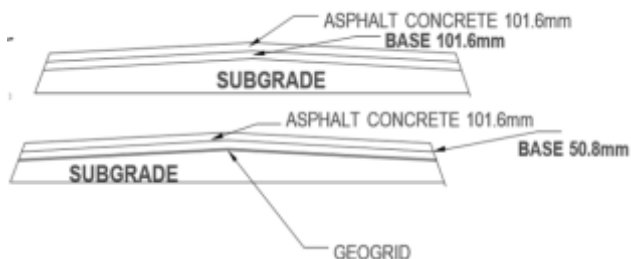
The geometric design of the pavement layers for both reinforced and unreinforced.
